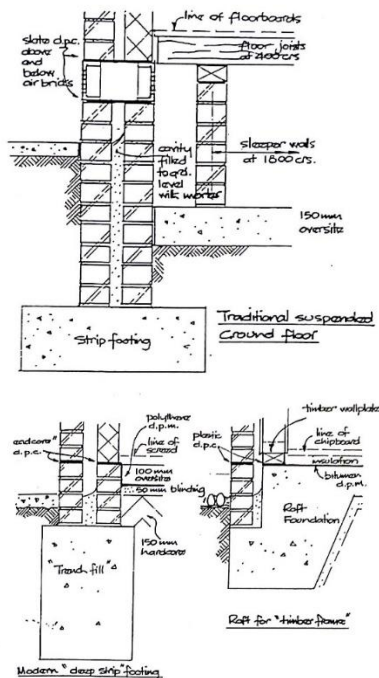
Foundation and Ground floor details showing d.p.c’ (Boughton, 1983, p. 31)
